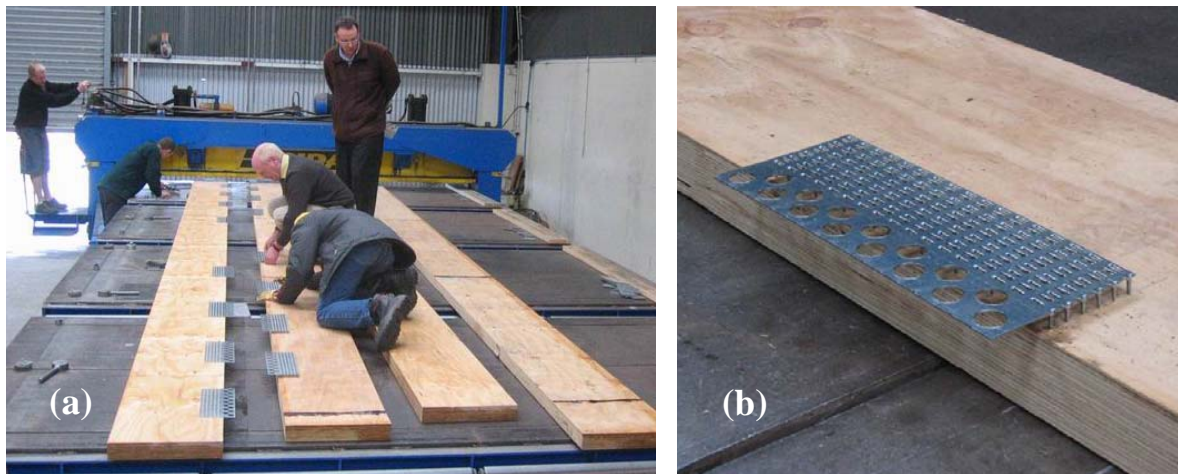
(a) Pressing in of metal plates into LVL for beams F1 and F2 at Westlake Timbers, Christchurch (a fabricator of Mitek); (b) Close up of metal plate
